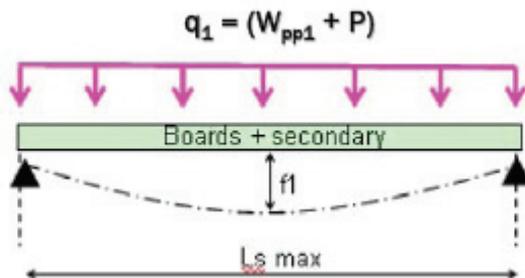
Scheme of double frame ceiling: plasterboard and secondary structure.
